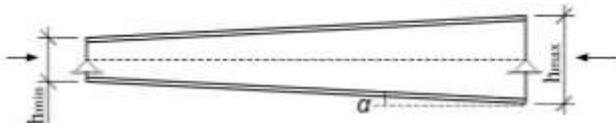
Typical Geometry of L Shaped Tapered Column Section
